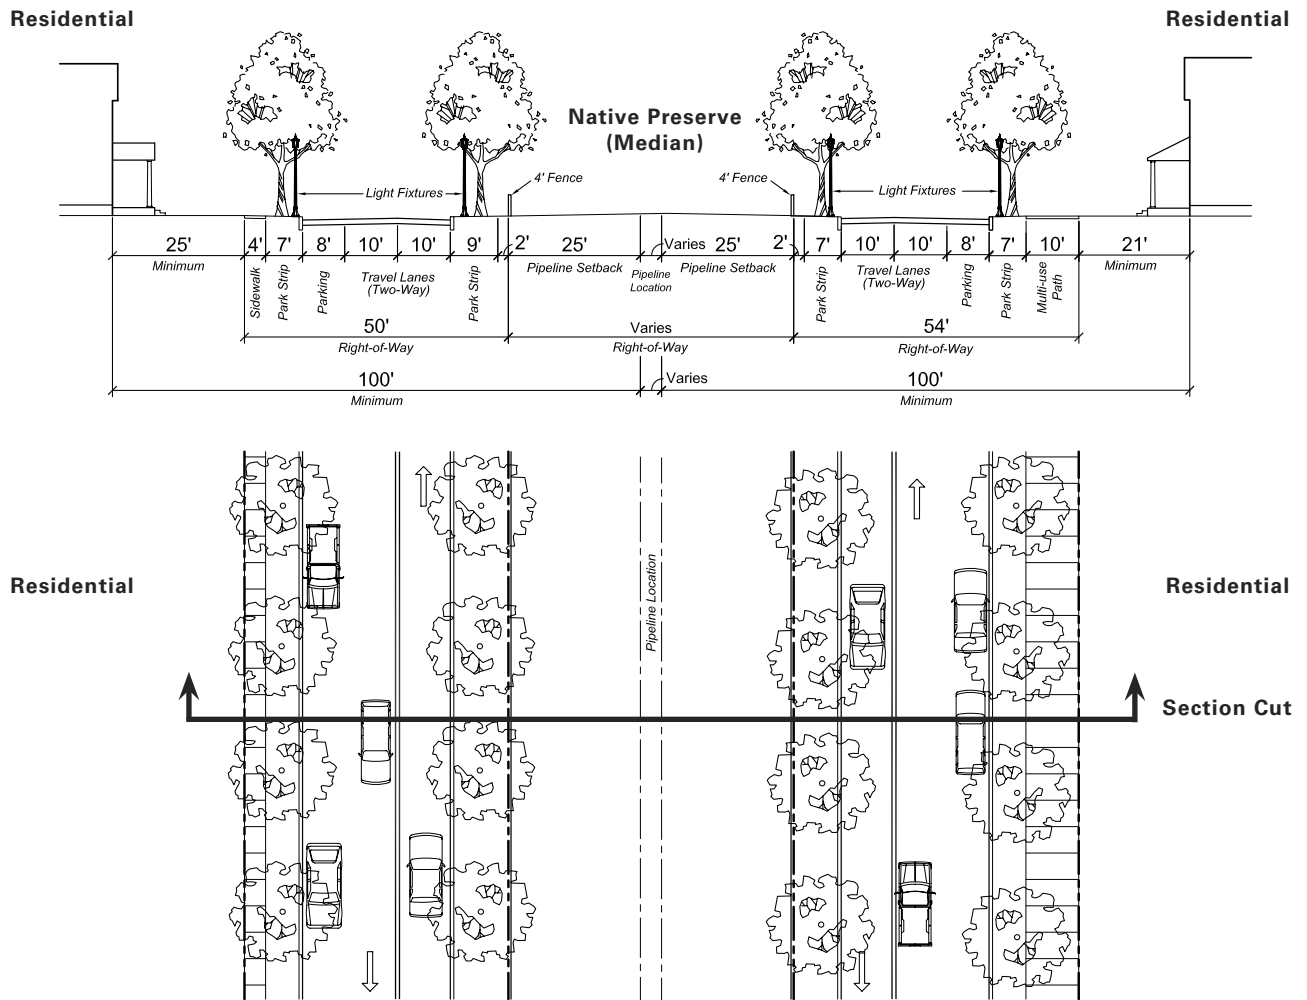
Proposed Section and Plan: Neighborhood Street F
